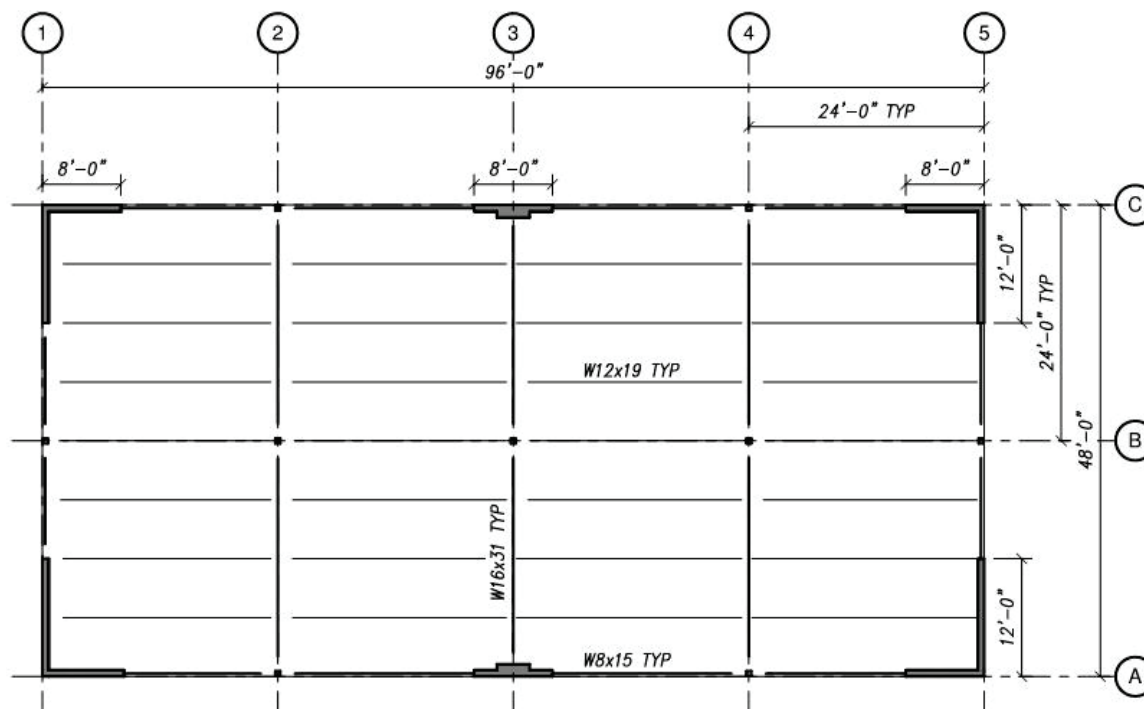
Two-story commercial building typical framing plan: COM2, COM5, COM8.
